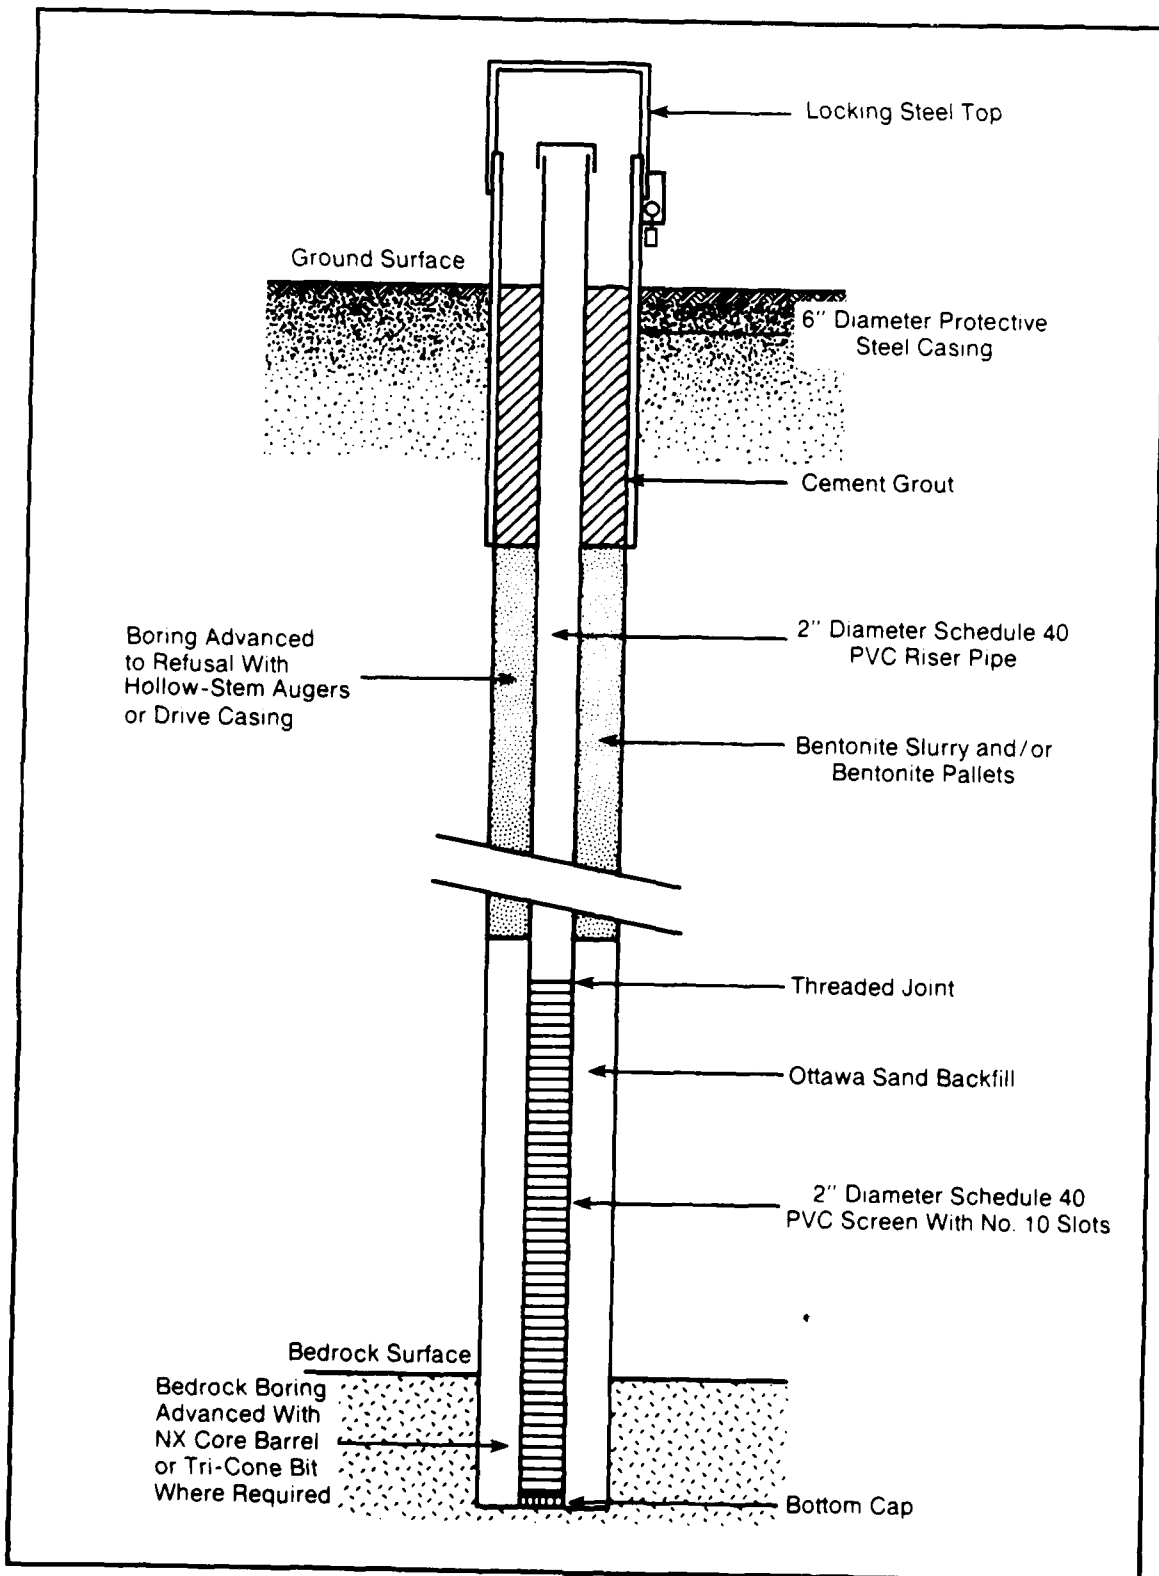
TYPICAL MONITORING WELL INSTALLATION
